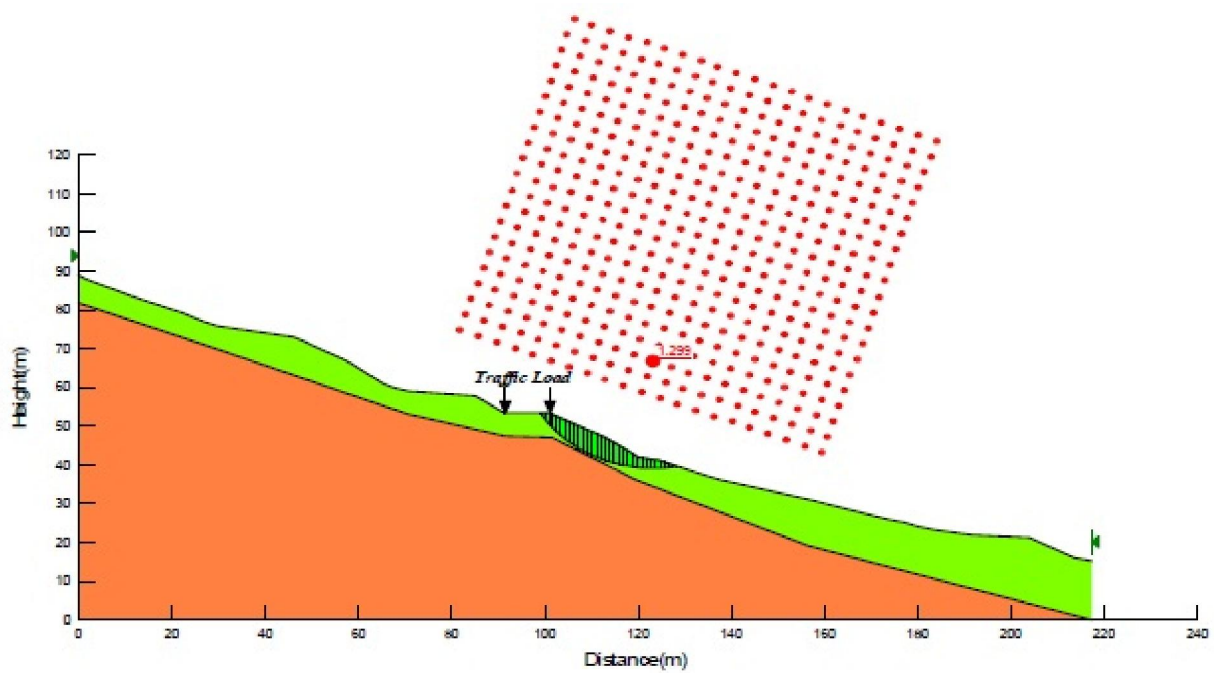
Slope stability in A-A section in effective soil stress conditions (static mode)
